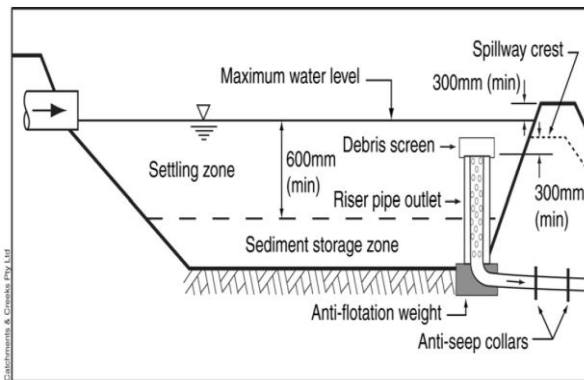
Sediment retention pond with perforated upstand outlet (Source: IECA, 2008)
